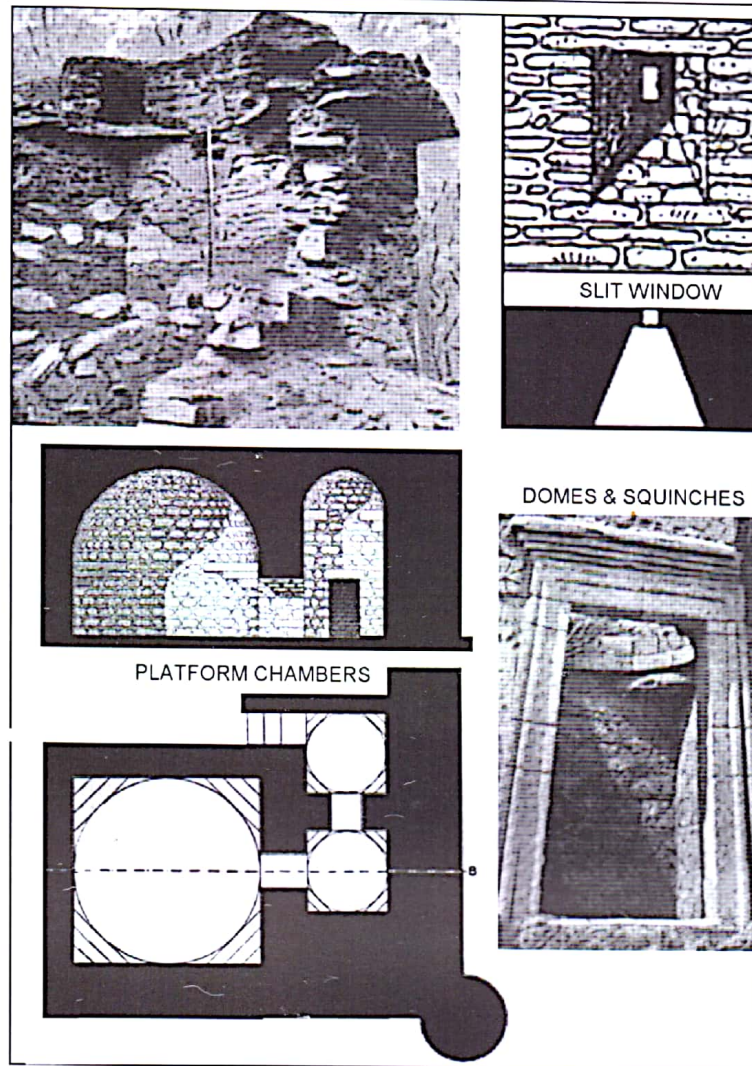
Examples of Gandharan construction, (after Foucher 1905: figs. 30, 32, 36, 37): example of slit window, plan and elevation, Takht-i-bāhī (upper right); door and dome, *vihāra* near Chakdarra (lower right); domes on square bases, chambers in basement, underground cellars, Sanghao (lower left); example of corbelling, ruined chapel, upper monastery, Nathou (upper left).
